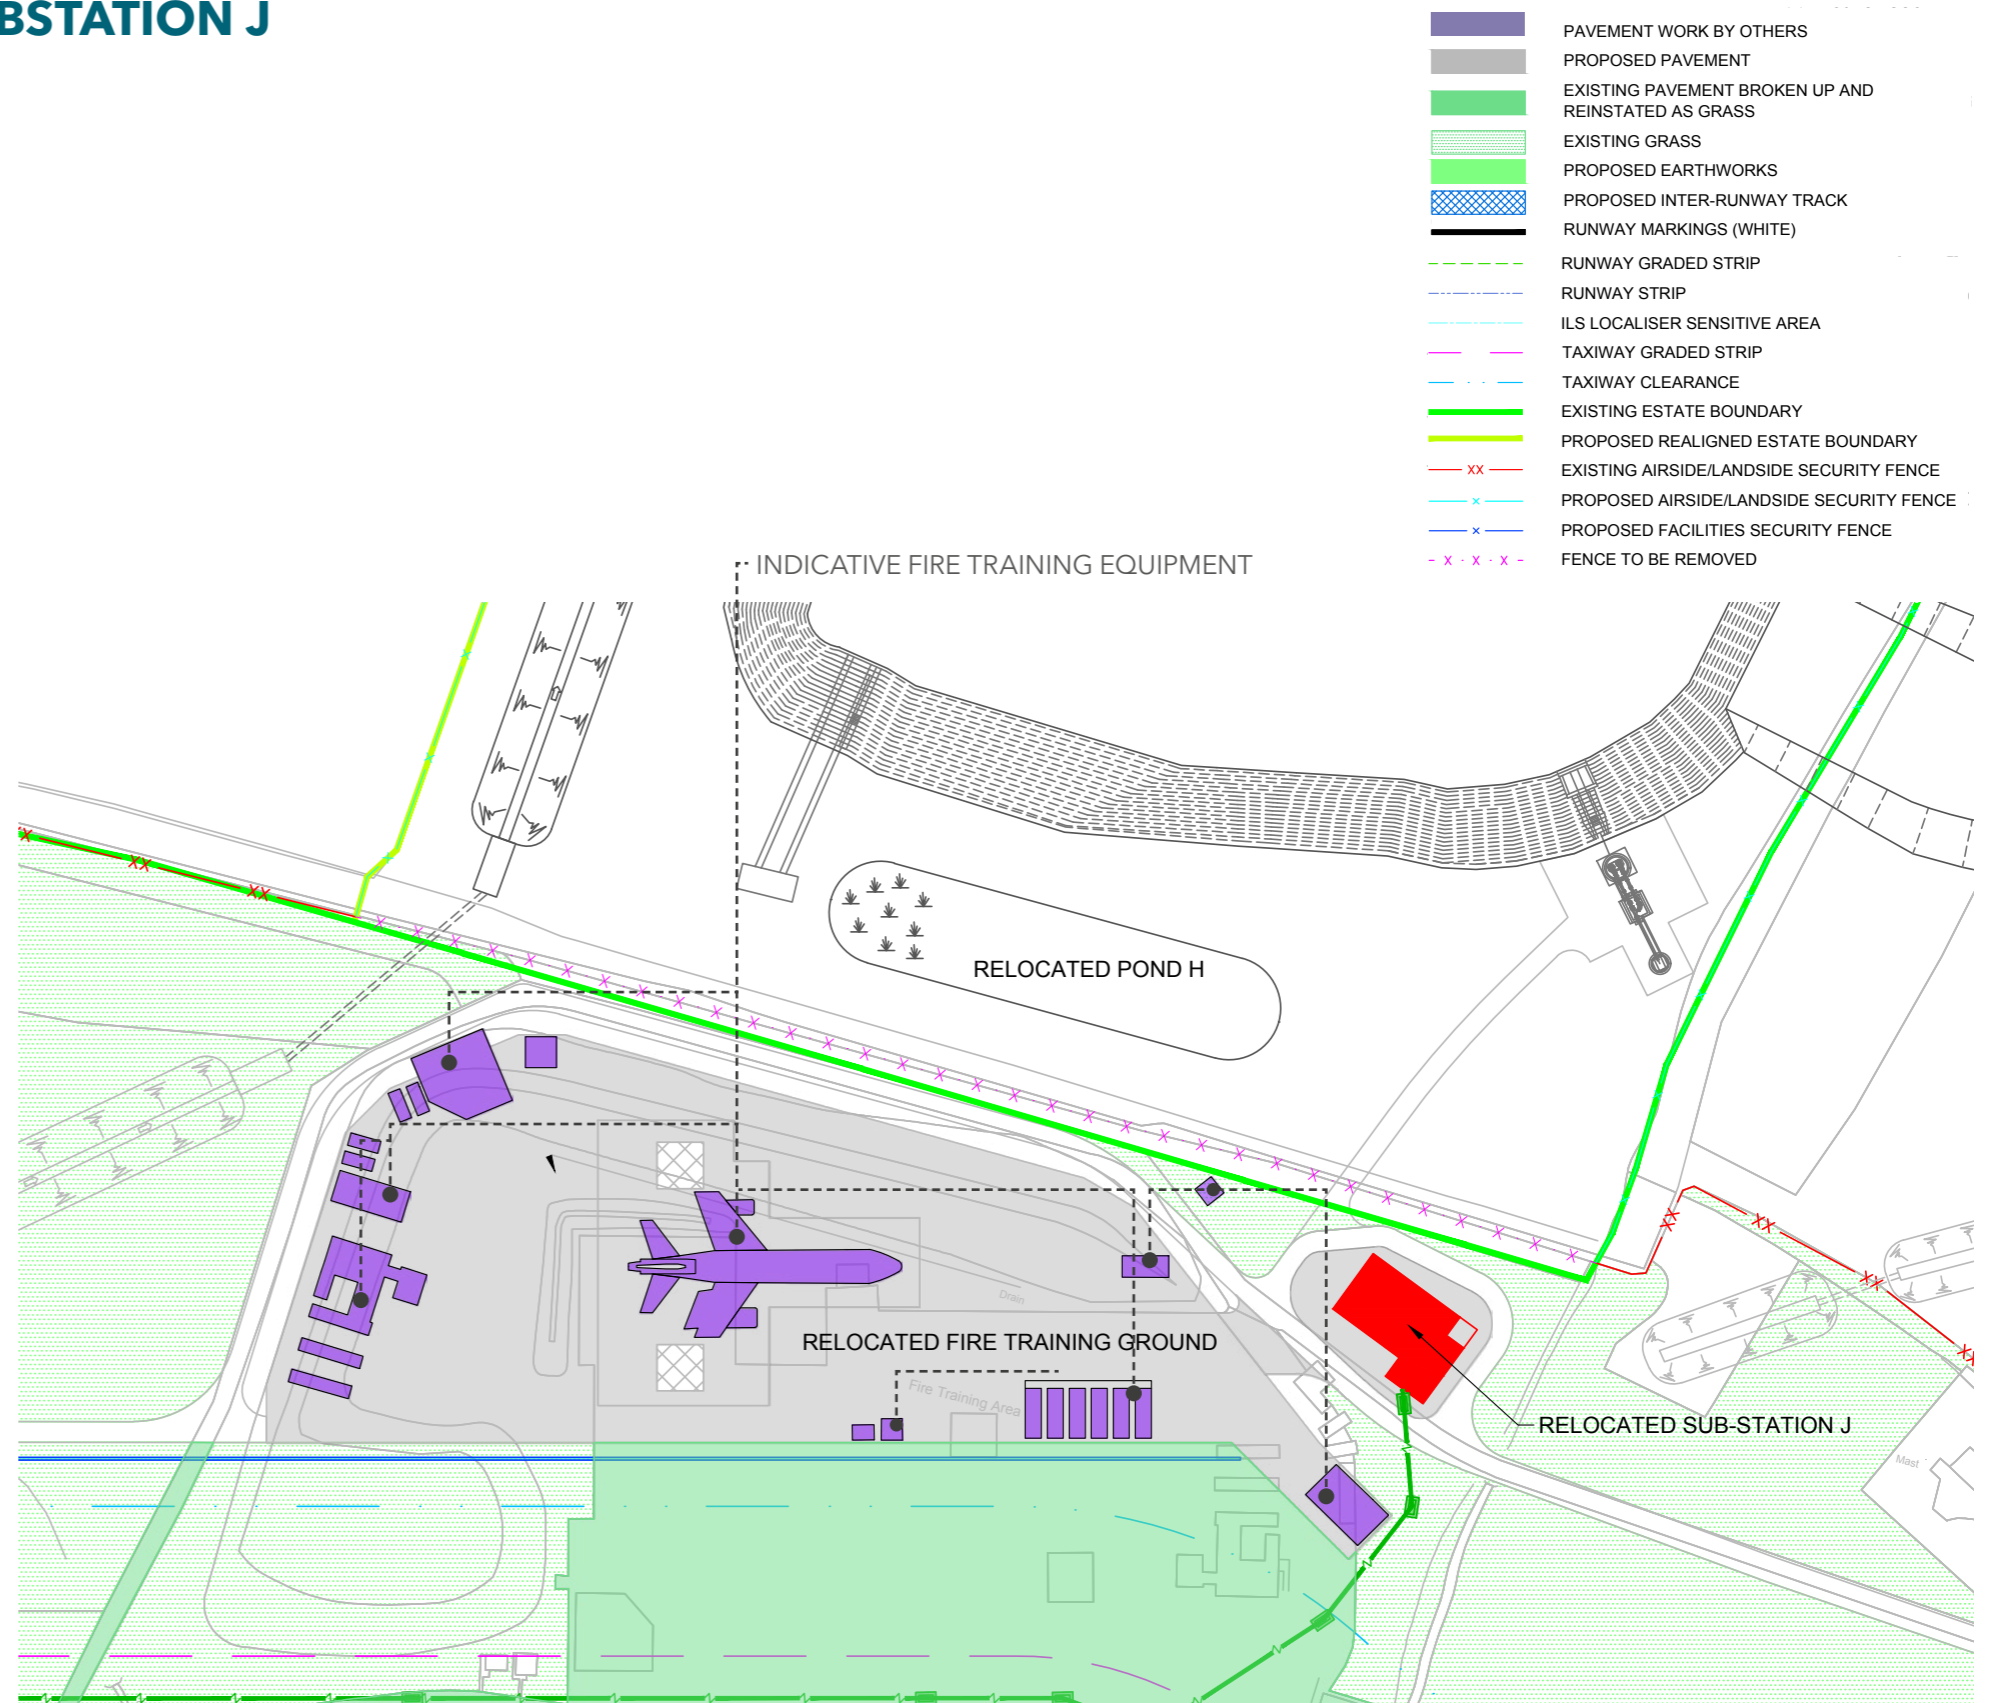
Indicative Ground Floor Plan - Fire Training Ground And Sub Station J
